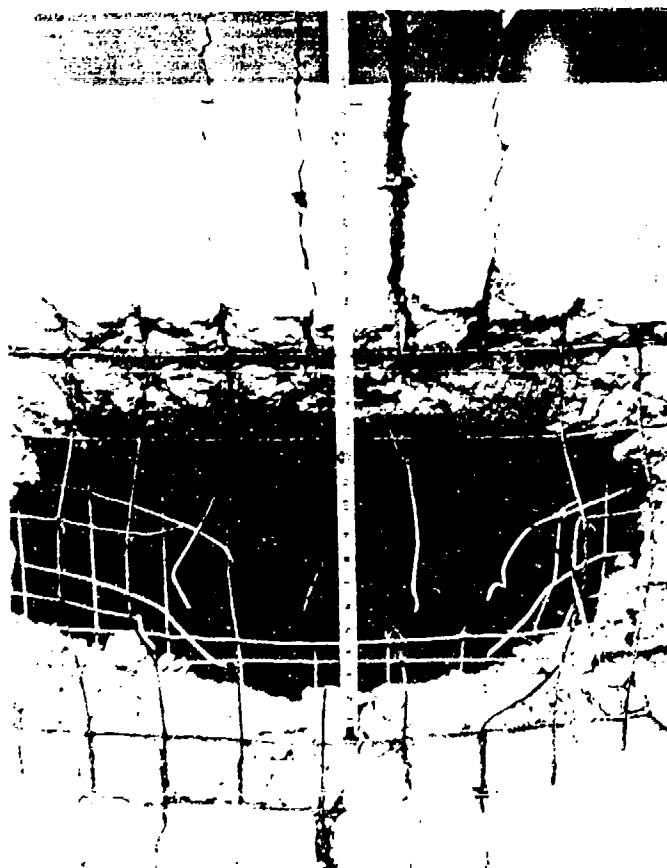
Test 11 Wall Damage Detail (Type A, 2.4-Pound Cased Charge).
